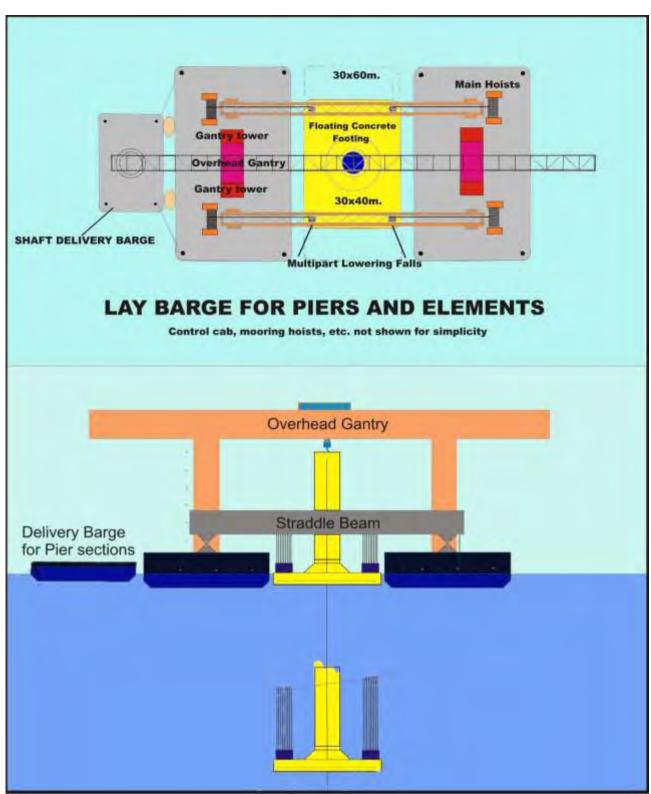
Plan and Elevation of equipment arrangement for building piers in situ.
